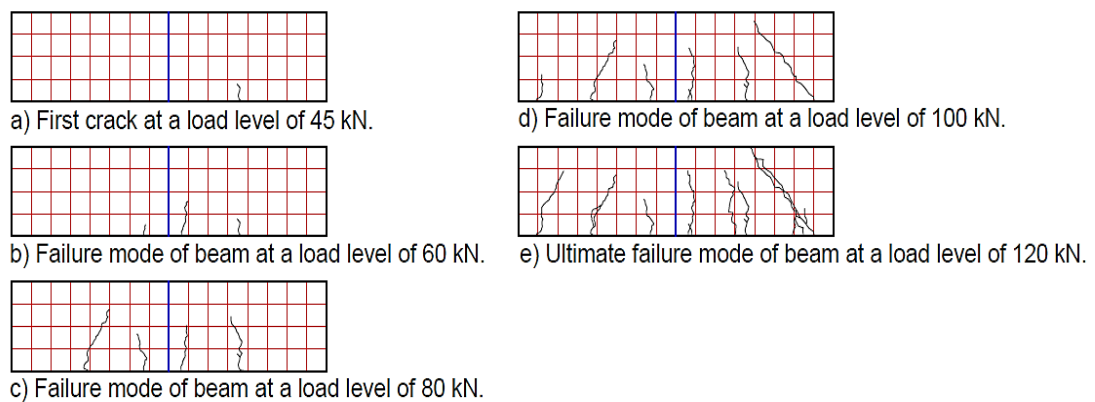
Crack Pattern of SFRC-0.7 Beam
